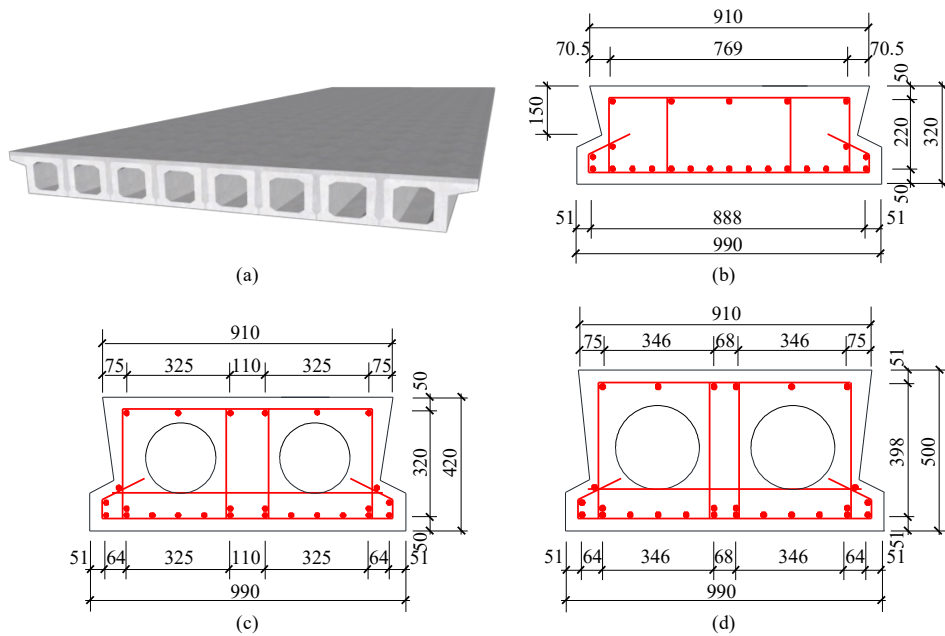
(a) Schematic of RC hollow beam; (b) cross-section of 6 m span beam; (c) cross-section of 8 m span beam; and (d) cross-section of 10 m span beam
